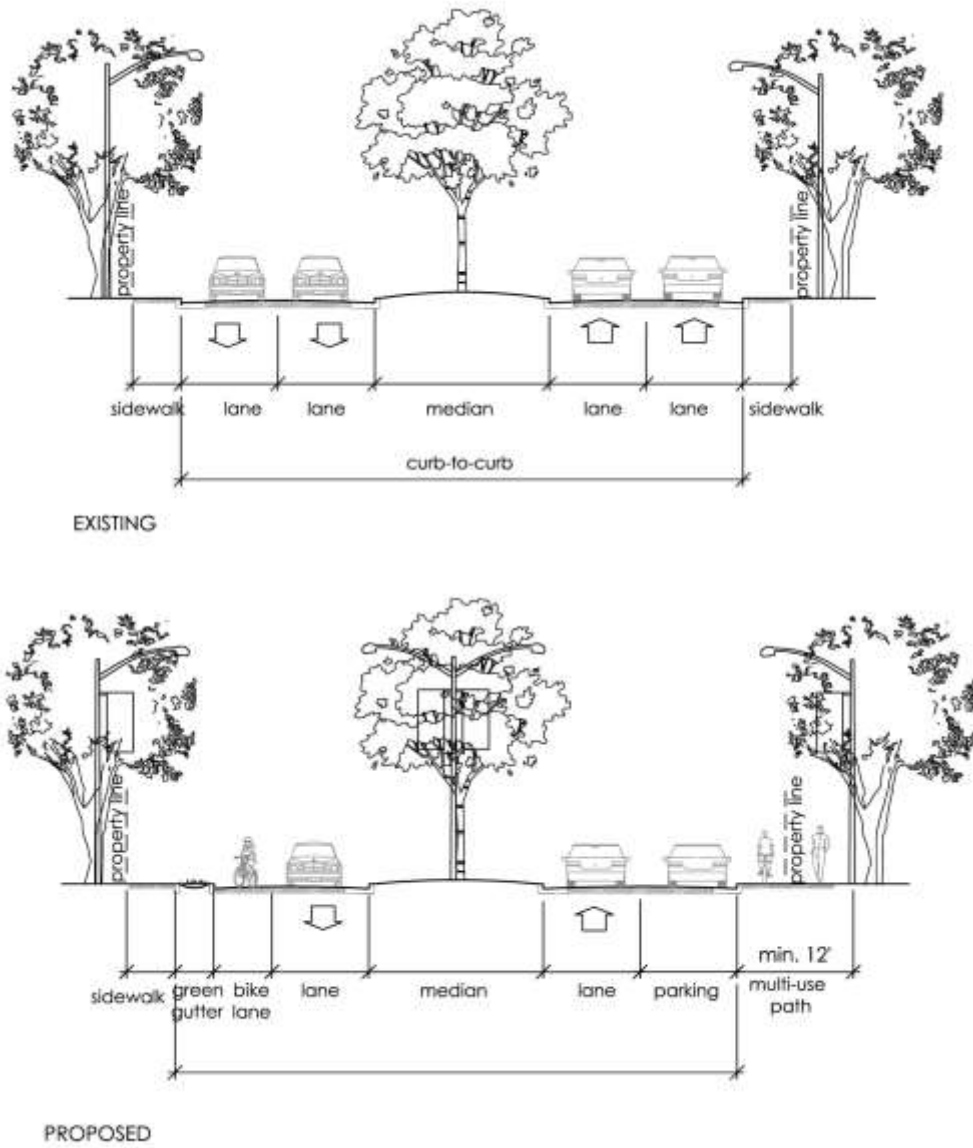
Enterprise Drive Street Section, Adjacent to Central Commercial Subarea
